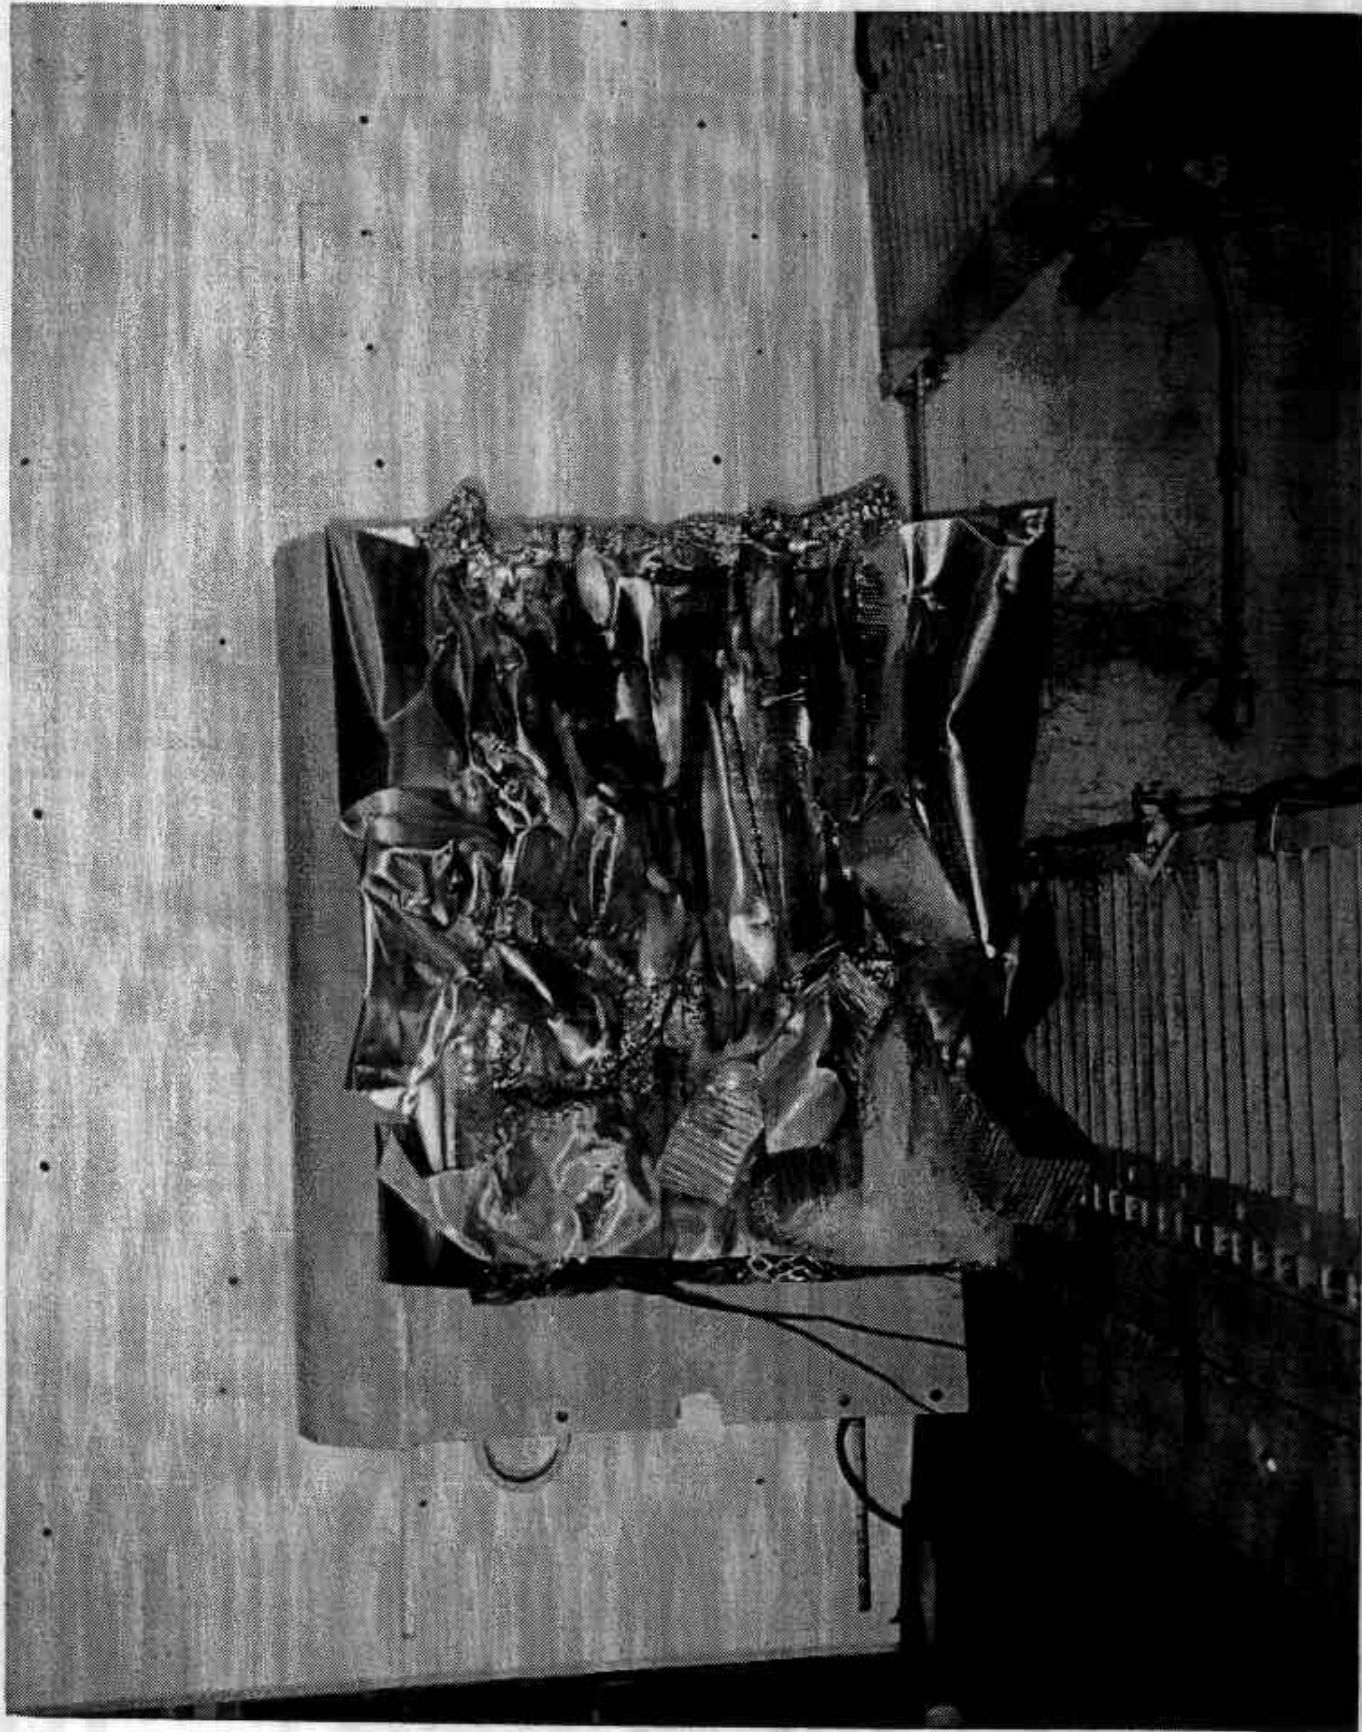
POST-TEST BARRIER FRONT VIEW
